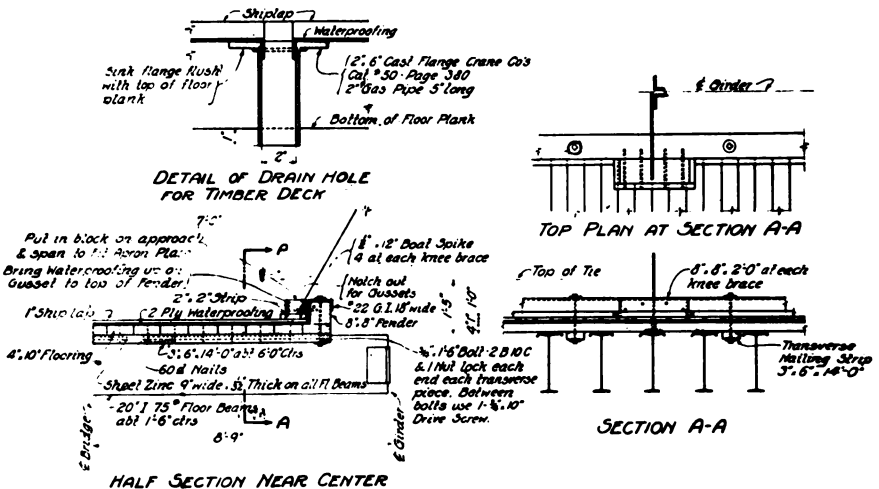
DETAILS OF WATERPROOFING TIMBER DECK WITH WOODEN PROTECTION COURSE.
